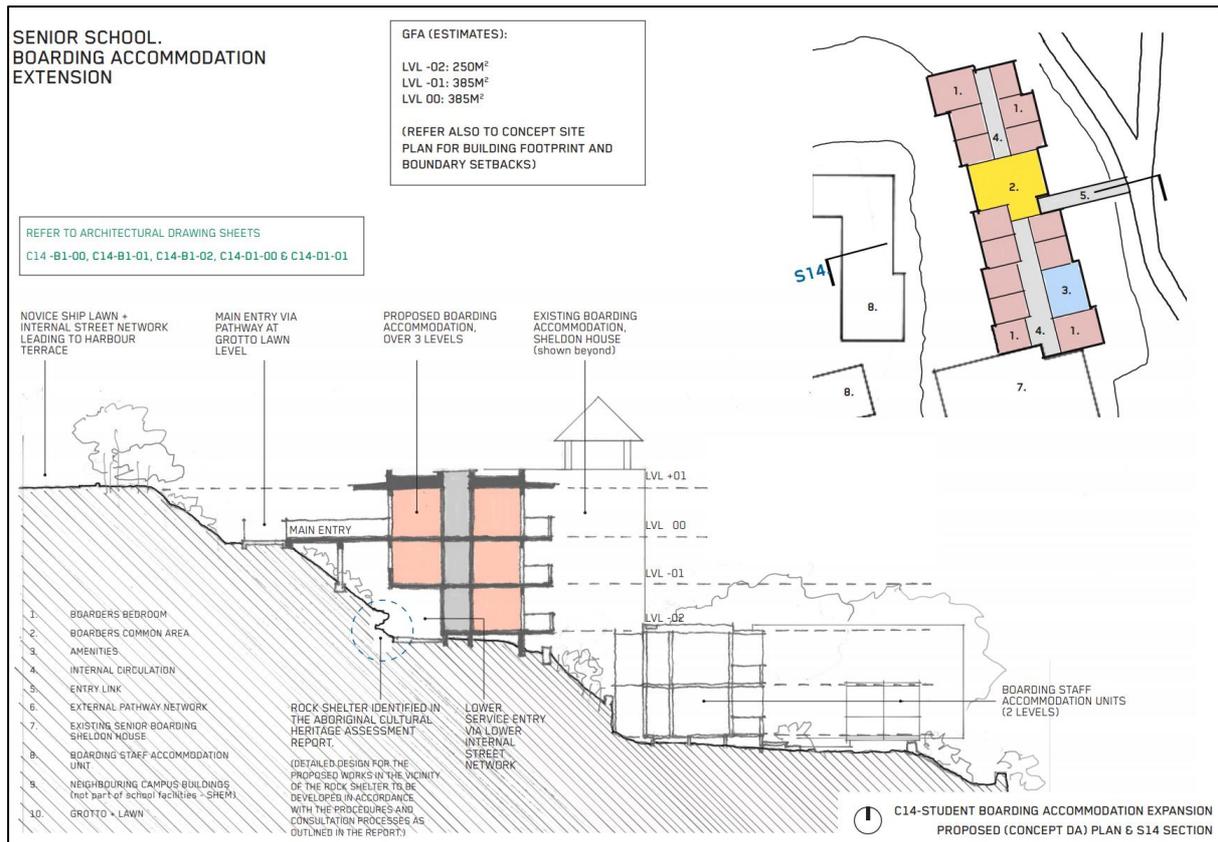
| Precinct C concept boarding house (Source: Applicant's RtS 2021)
